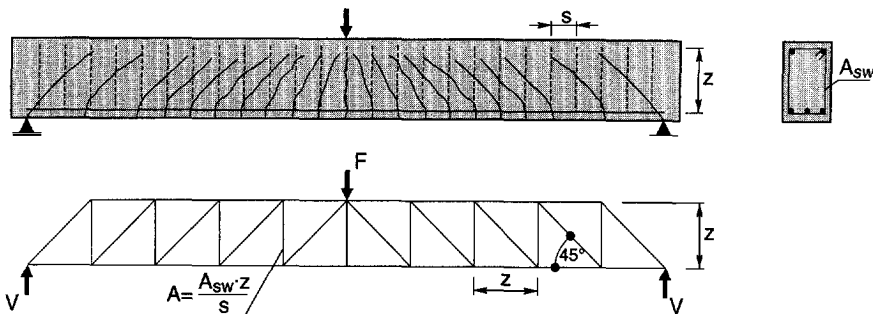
Fully developed crack pattern and truss model of Ritter and Mörsch
